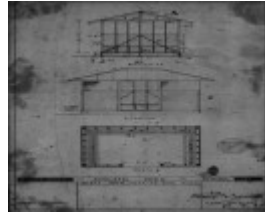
P. Everett, Plan, Elevation & Section A-A drawing of proposed Shelter Shed, Dixons Creek State School, 30 March 1935. Source: Building Services Agency (BSA) drawing, SSO1585.2, Public Record Office Victoria.
